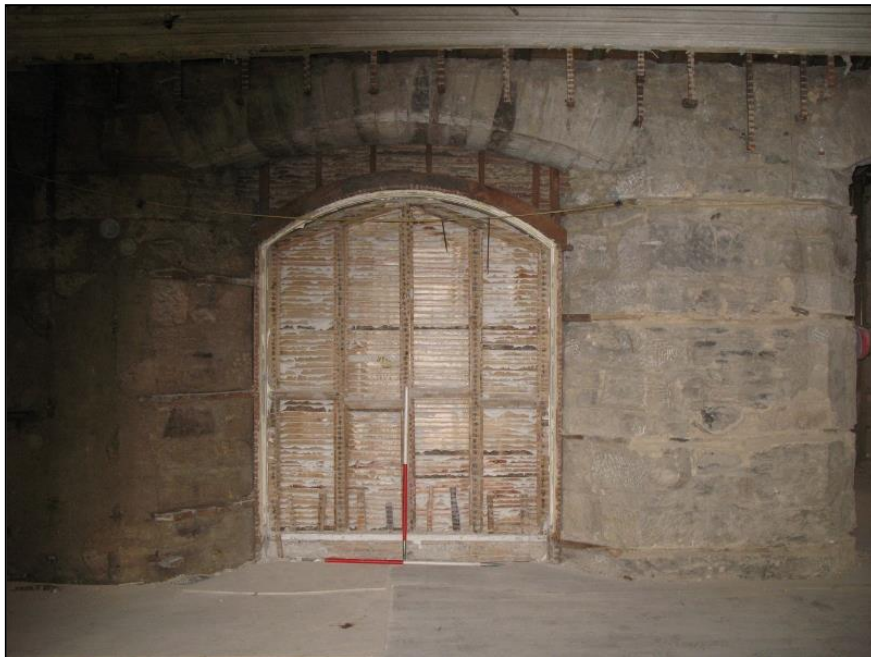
Central arched recess in E wall, Room 202, showing relict timber studwork
